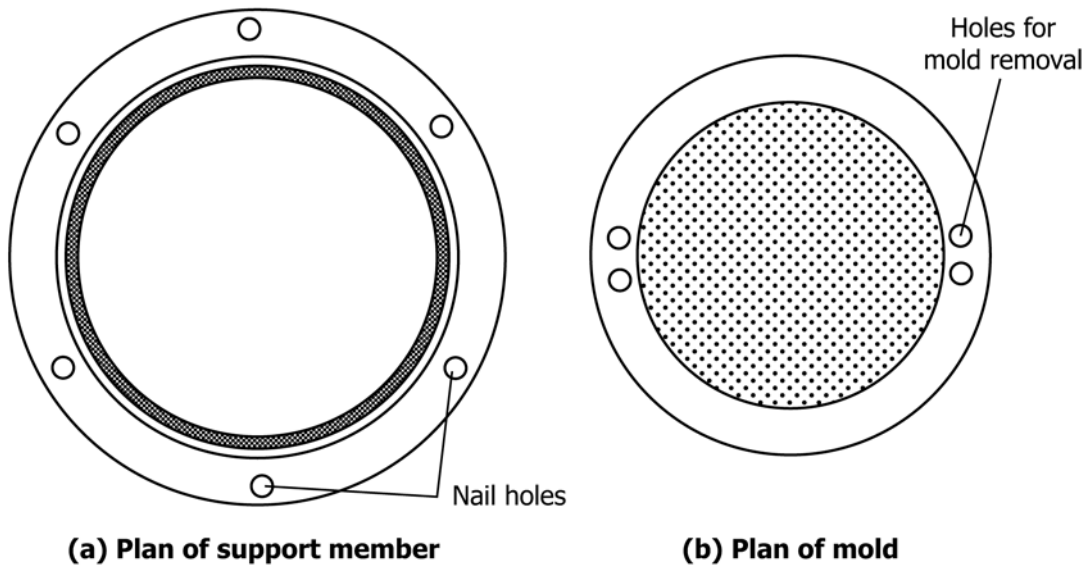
Schematic of Cast-in-Place Cylinder Mold Assembly
